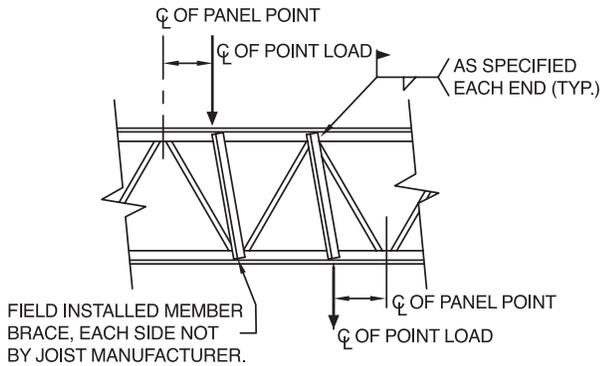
TYPICAL JOIST REINFORCEMENT AT CONCENTRATED LOADS
